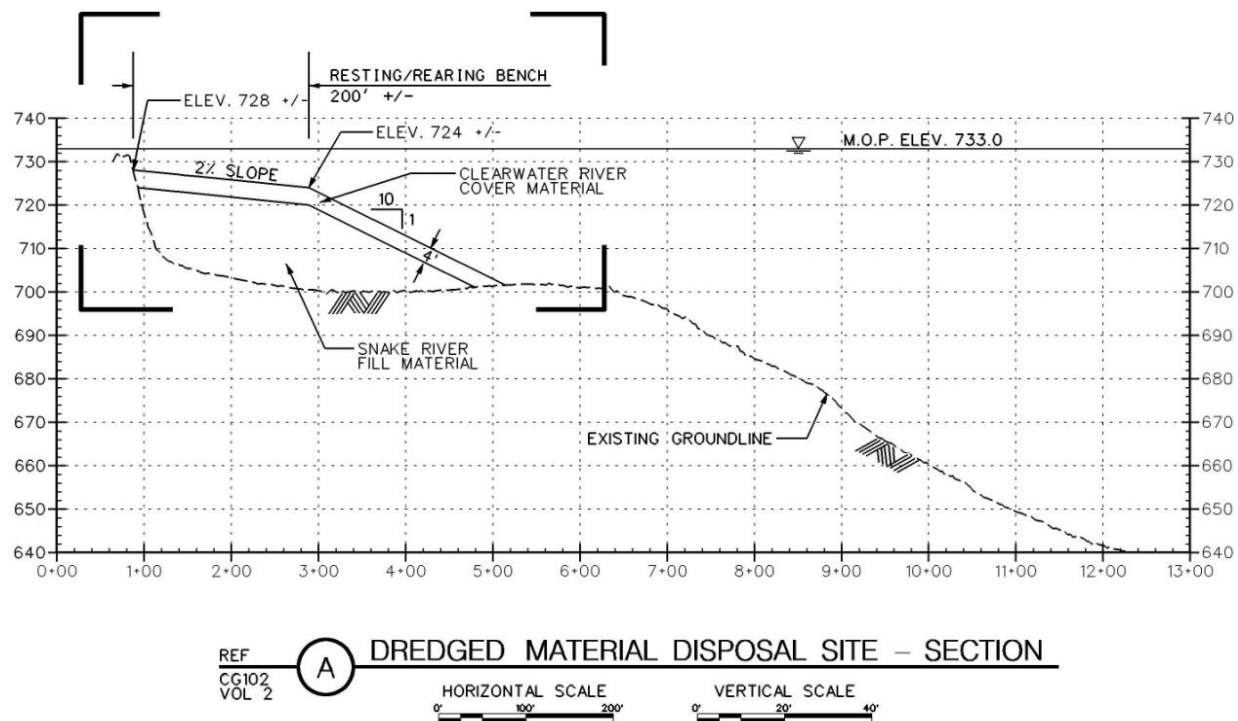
Cross sectional view of proposed disposal site at Knoxway Bench.
